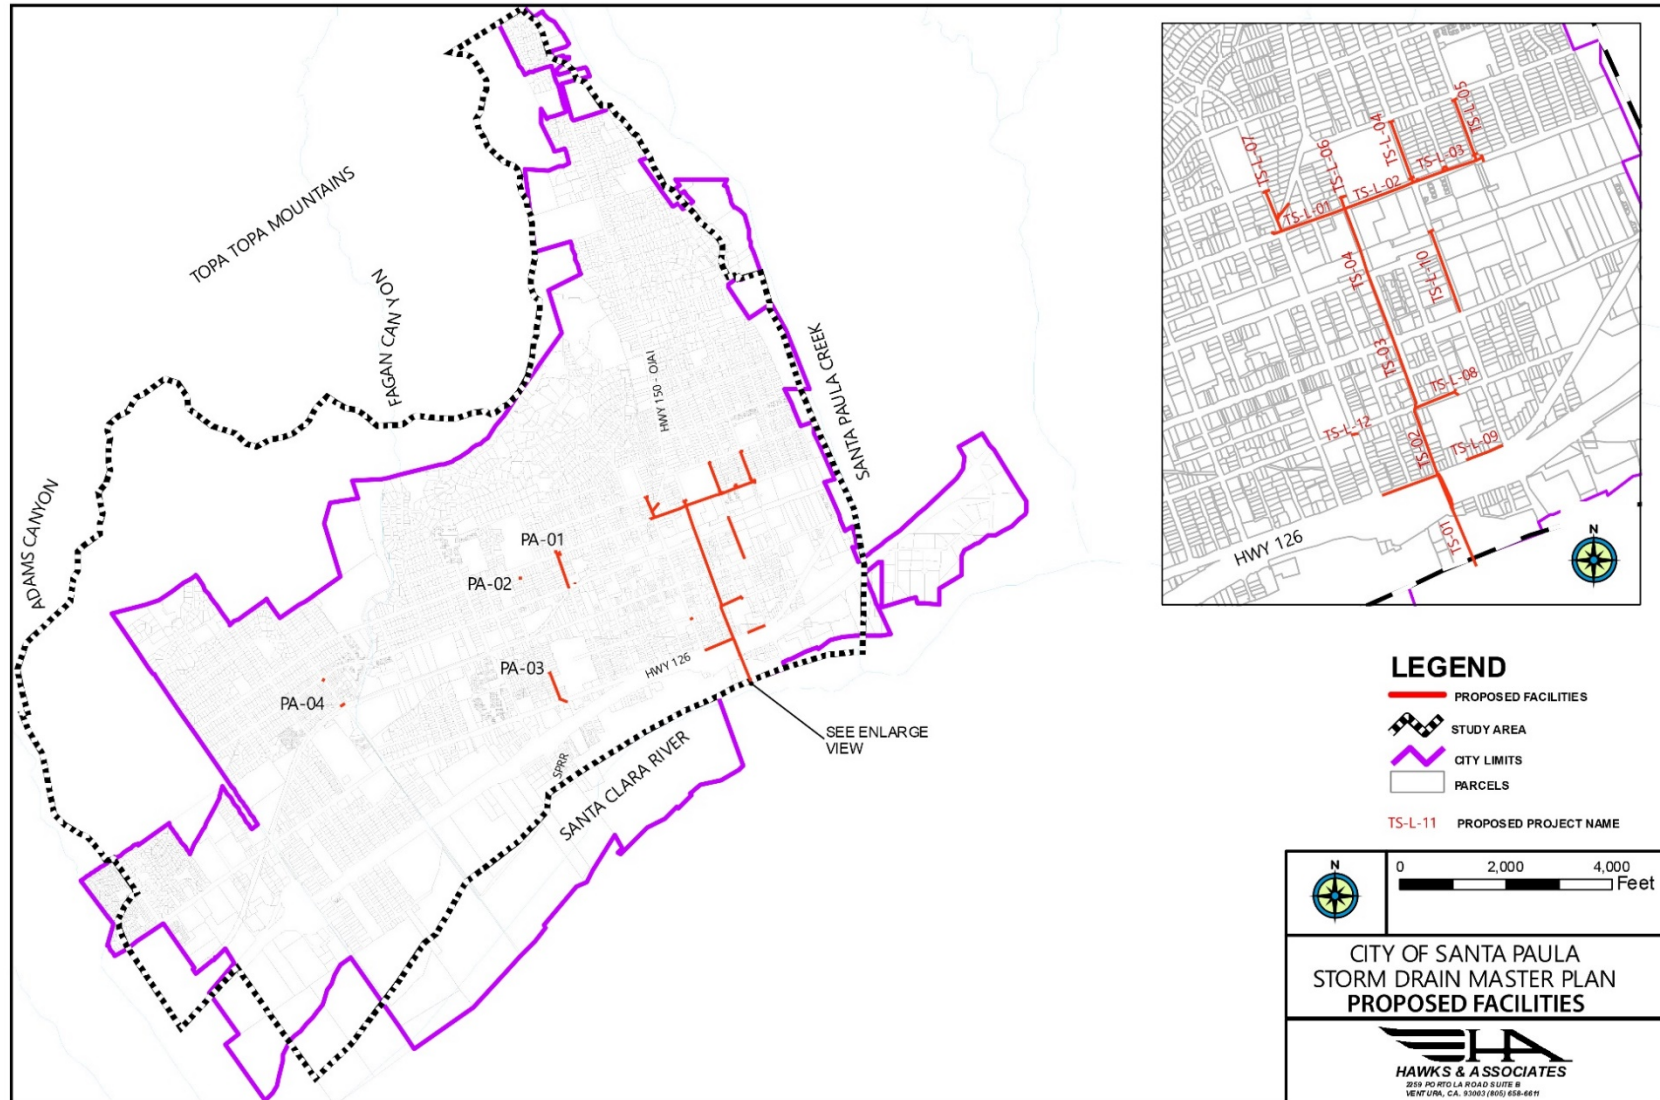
Proposed Drainage Facility Improvements
